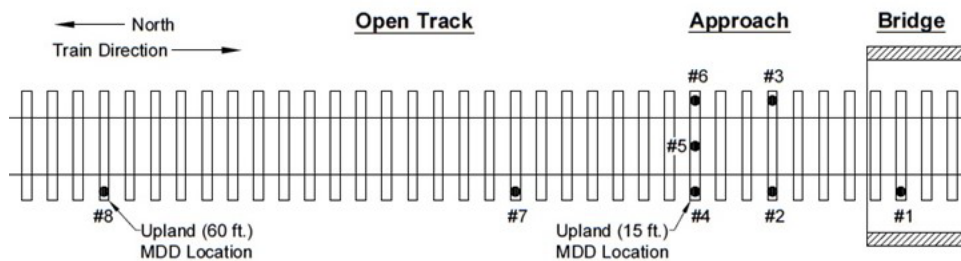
Instrumentation location of accelerometers and LVDTs at the Upland Street bridge approach
